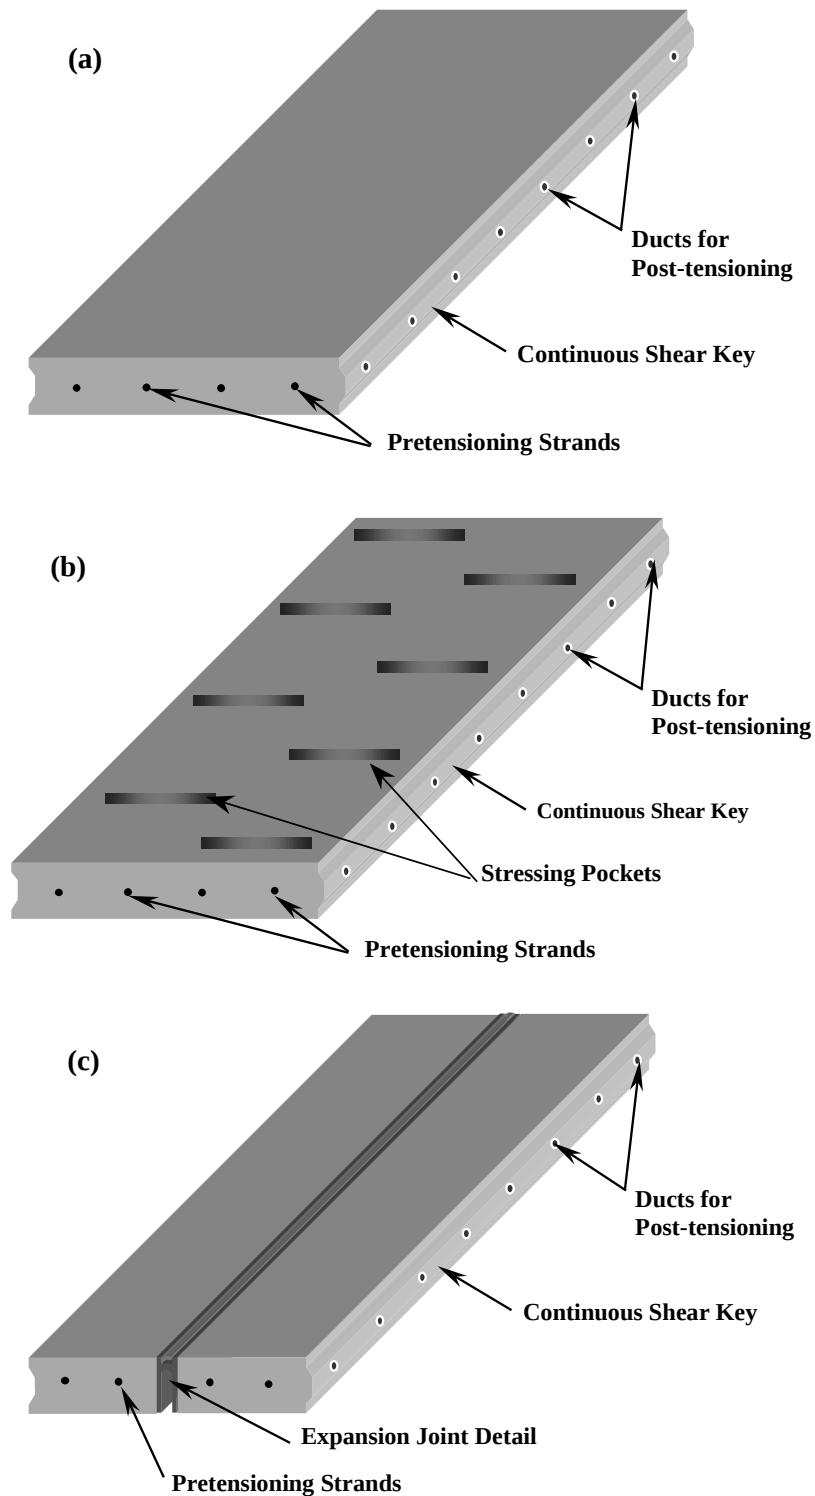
Three types of panels used for a precast pavement: (a) Base Panel, (b) Central Stressing Panel, (c) Joint Panel⁽³⁾.
